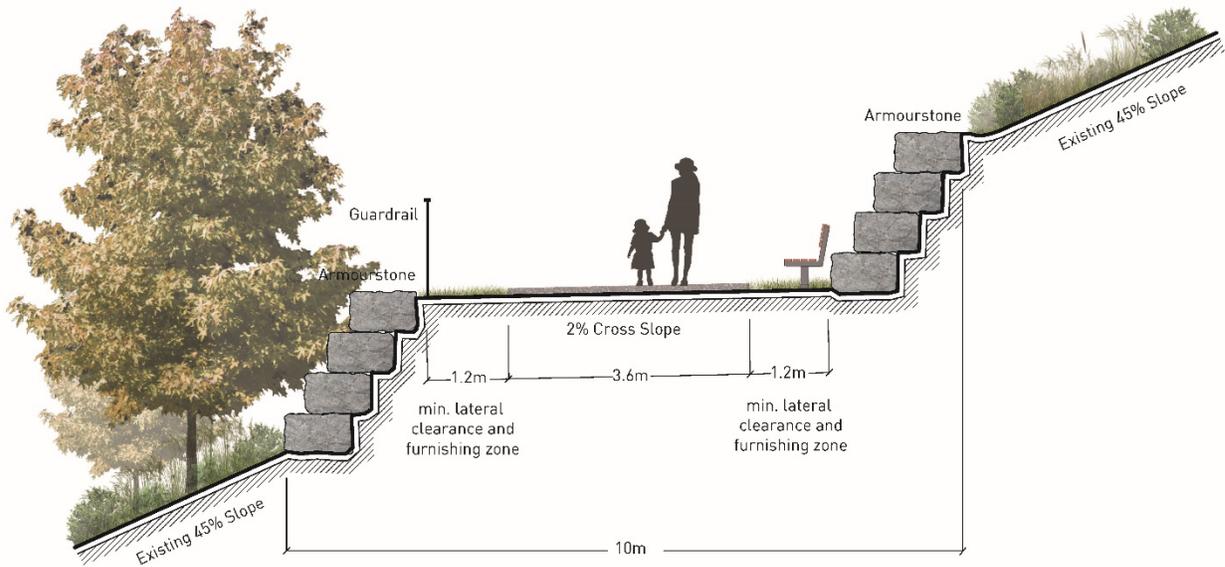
Conceptual cross-section of the Highland Creek east slope multi-use trail
